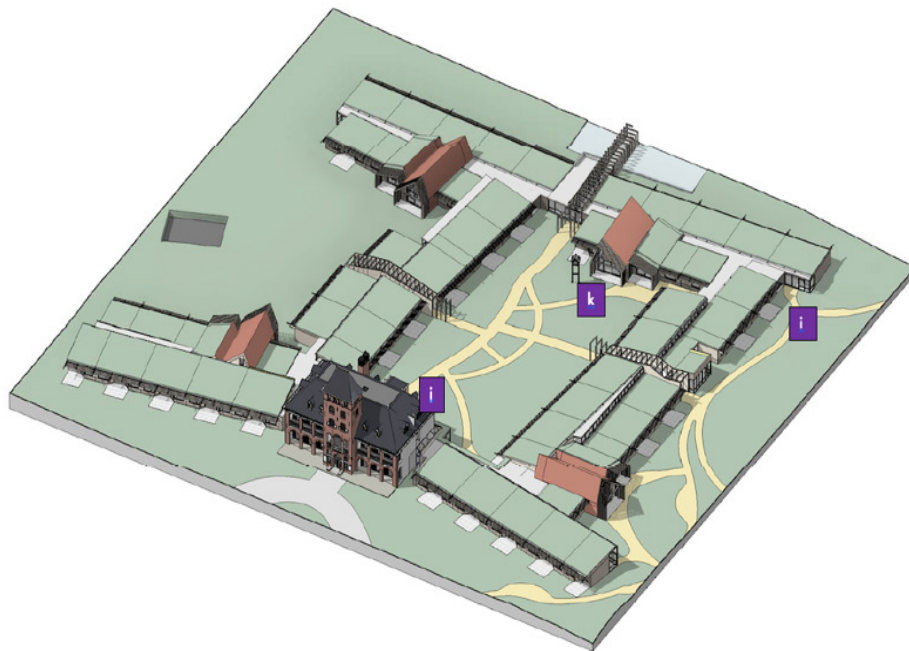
Site plan (©MAAK Architectuur/Nexit Architecten).
